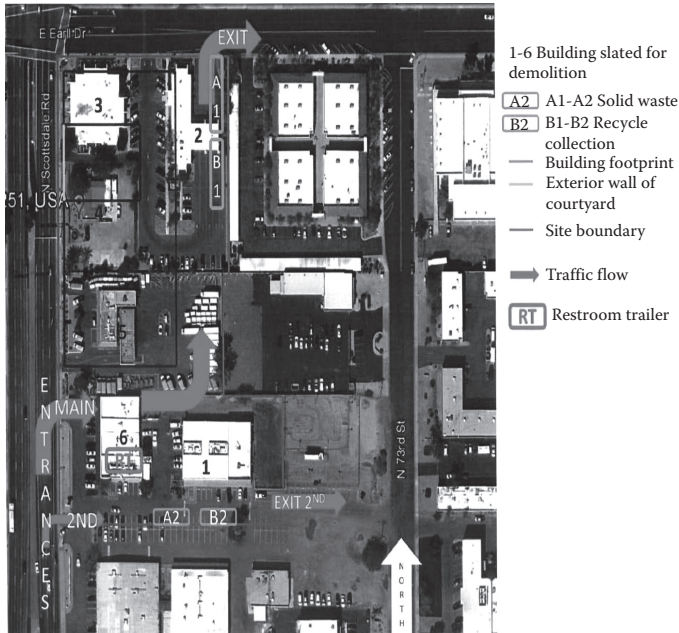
On-site traffic, waste disposal, demolition, and building footprint. (Courtesy of Donald McFadden.)
